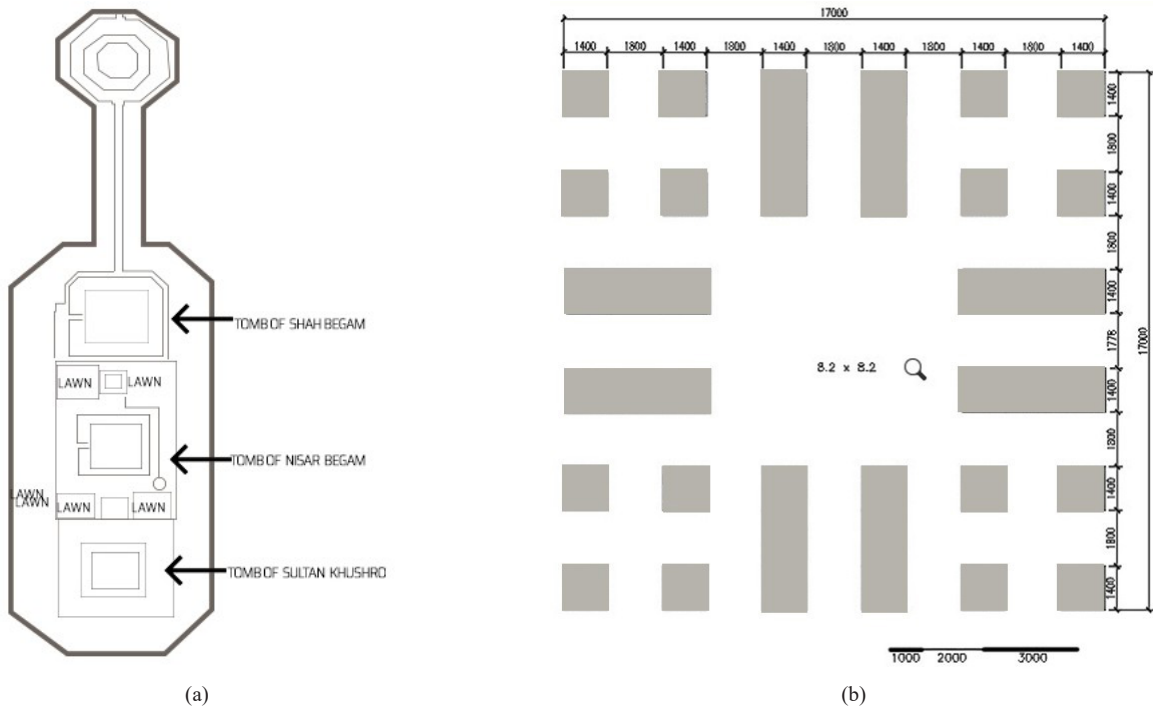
(a) Plan of the Khusro Bagh; (b) Ground Floor Plan of the Tomb.
